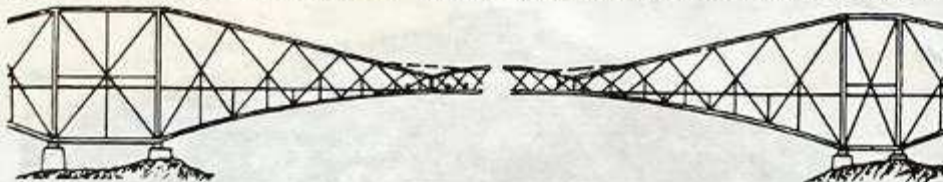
Completing a central girder. Vernon-Harcourt (1902). *Civil Engineering*.
